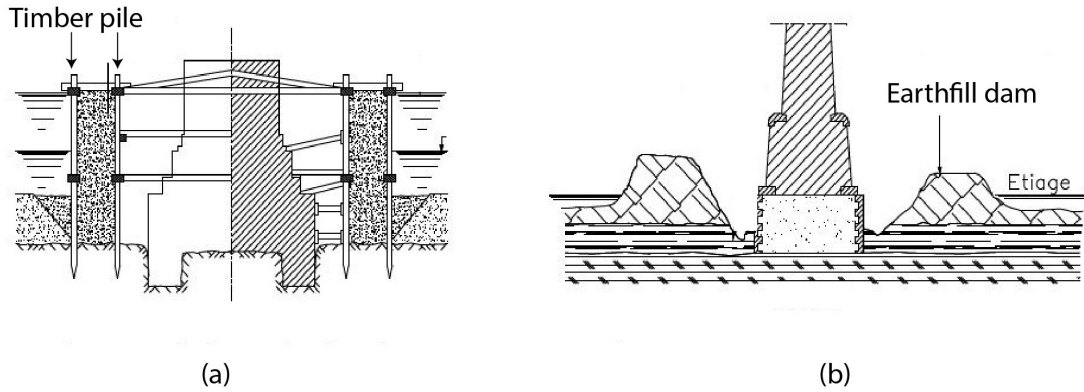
Mass concrete foundation surrounded by: (a) timber pile; (b) earthfill dam (adapted from [SNCF, 2005](#)).
